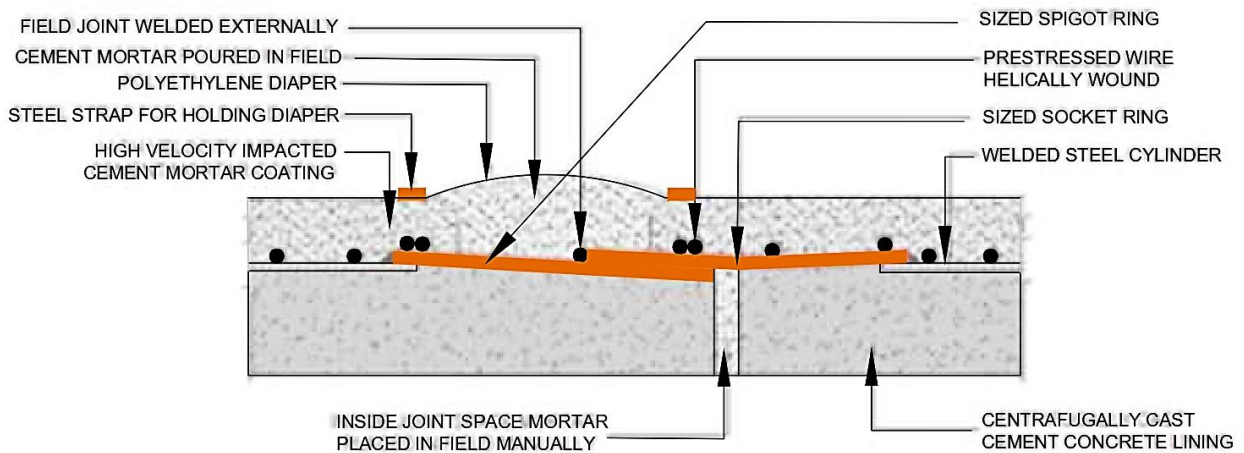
PCCP Pipe Sliding Overlap Welded Joint
